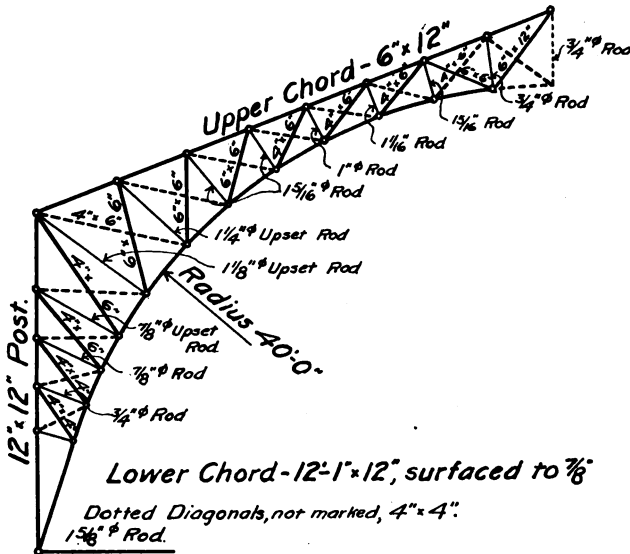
DIAGRAM OF 3-HINGED ARCHED TRUSS FOR MAIN EXPOSITION BUILDINGS.
